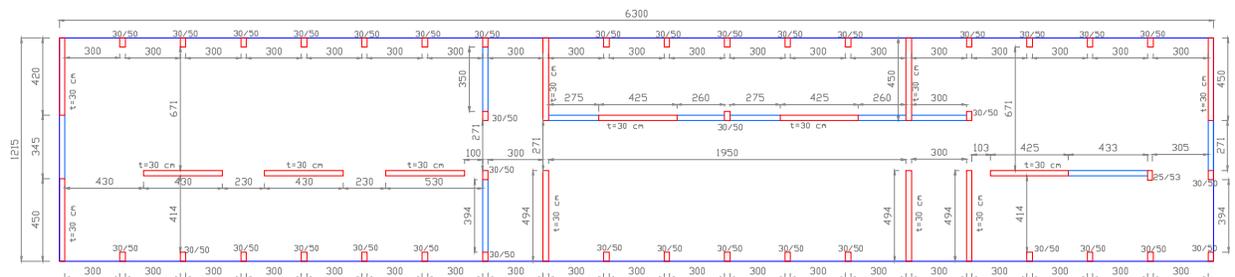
Structural floor plan for dormitory buildings. The masonry wall thickness was 0.3m. Dimensions are in cm.
